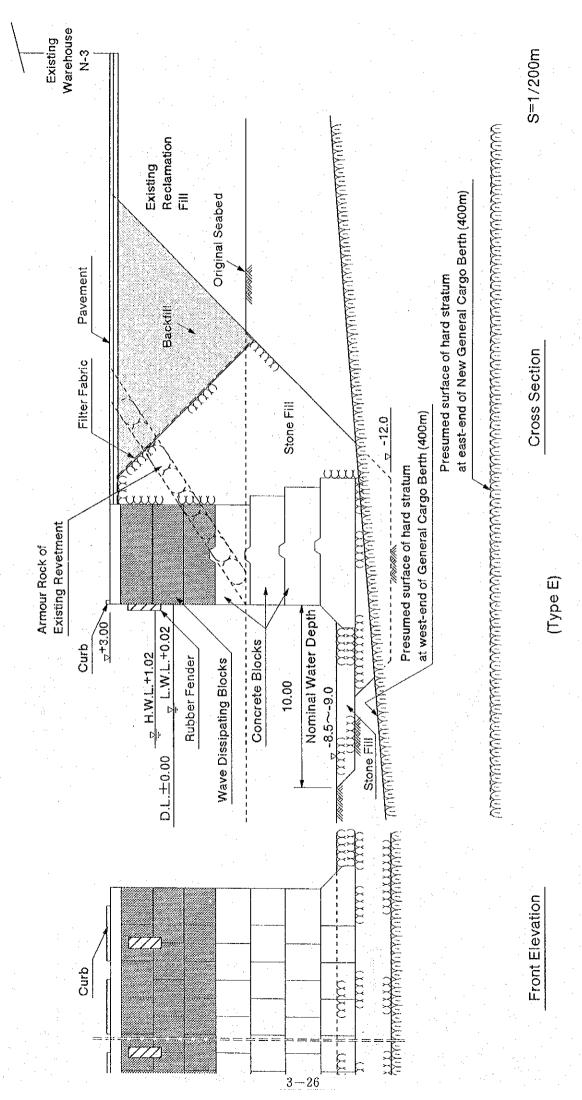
(a) Typical cross section of berthing facilities (-8.5~-9.0m General cargo berth)
